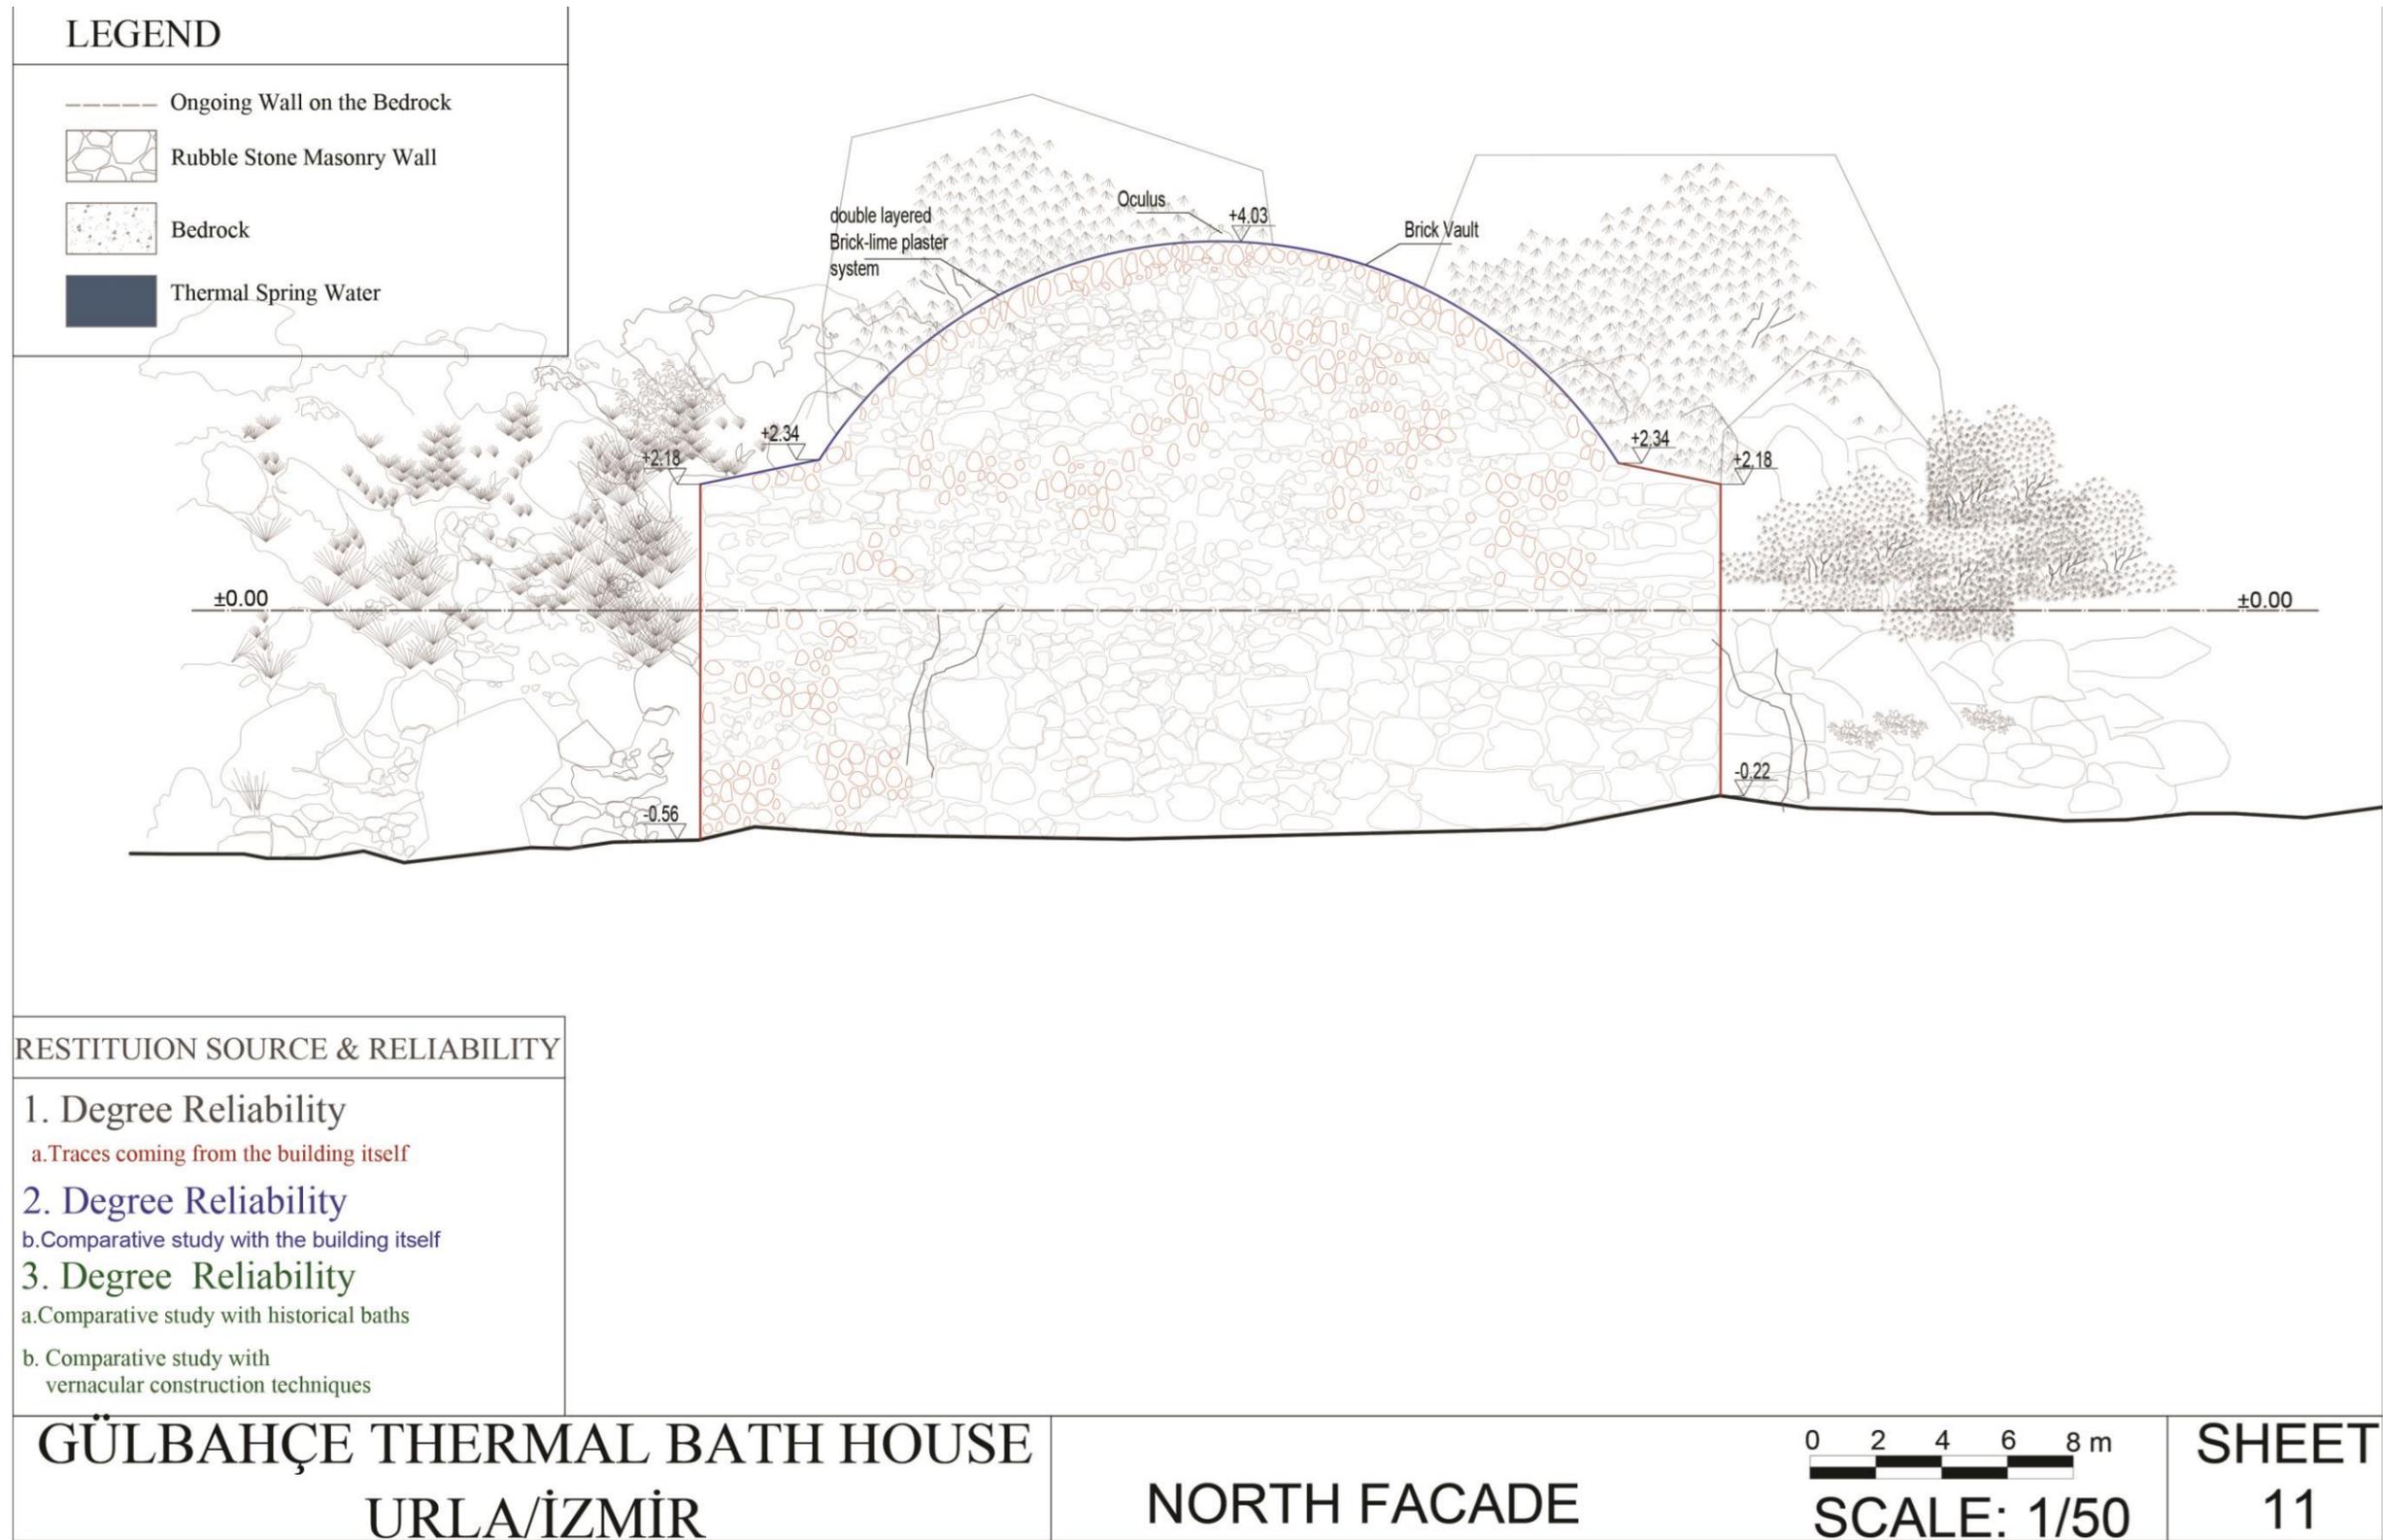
North Elevation -Restitution (Source: İYTE,2019)
